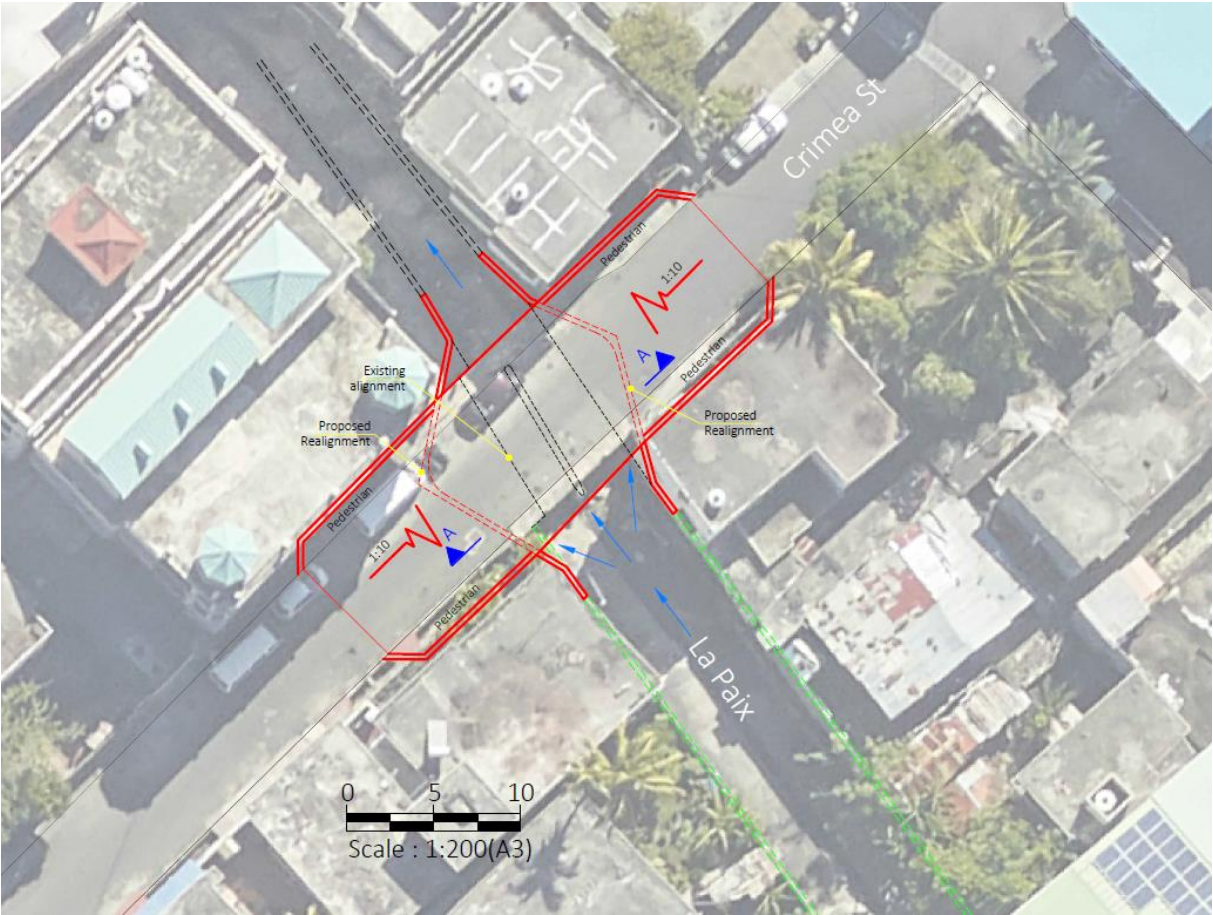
La Paix – Typical Resizing of Bridge within confined space– Drawings and section
